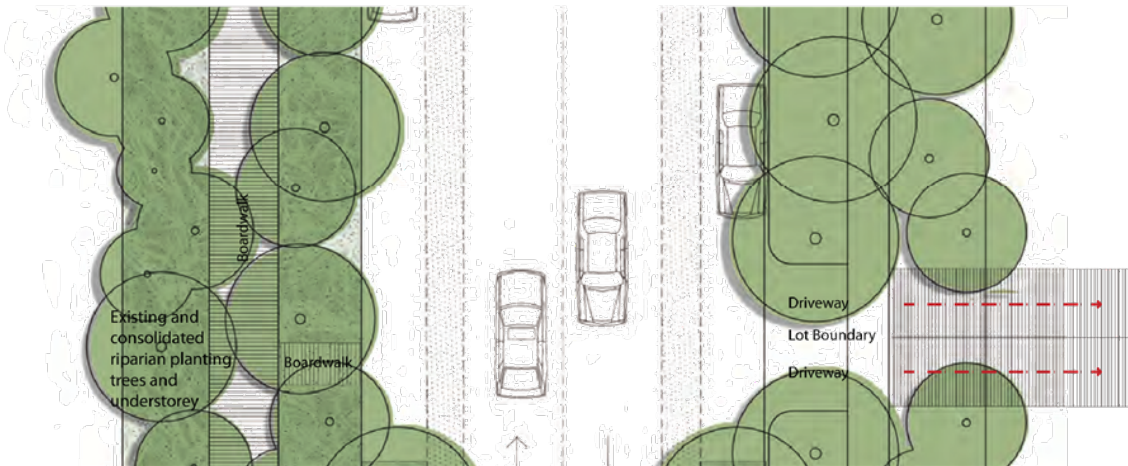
TYPE 7: PARK EDGE STREET
